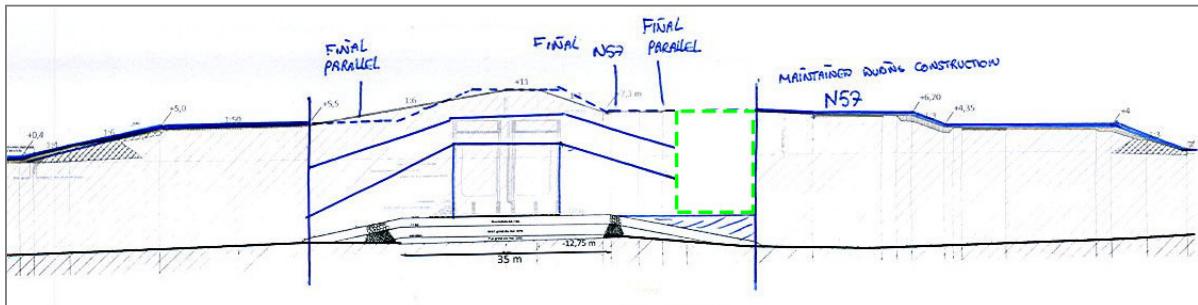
Variant 3A 'Siphon, built in the dry', cross-section during construction
